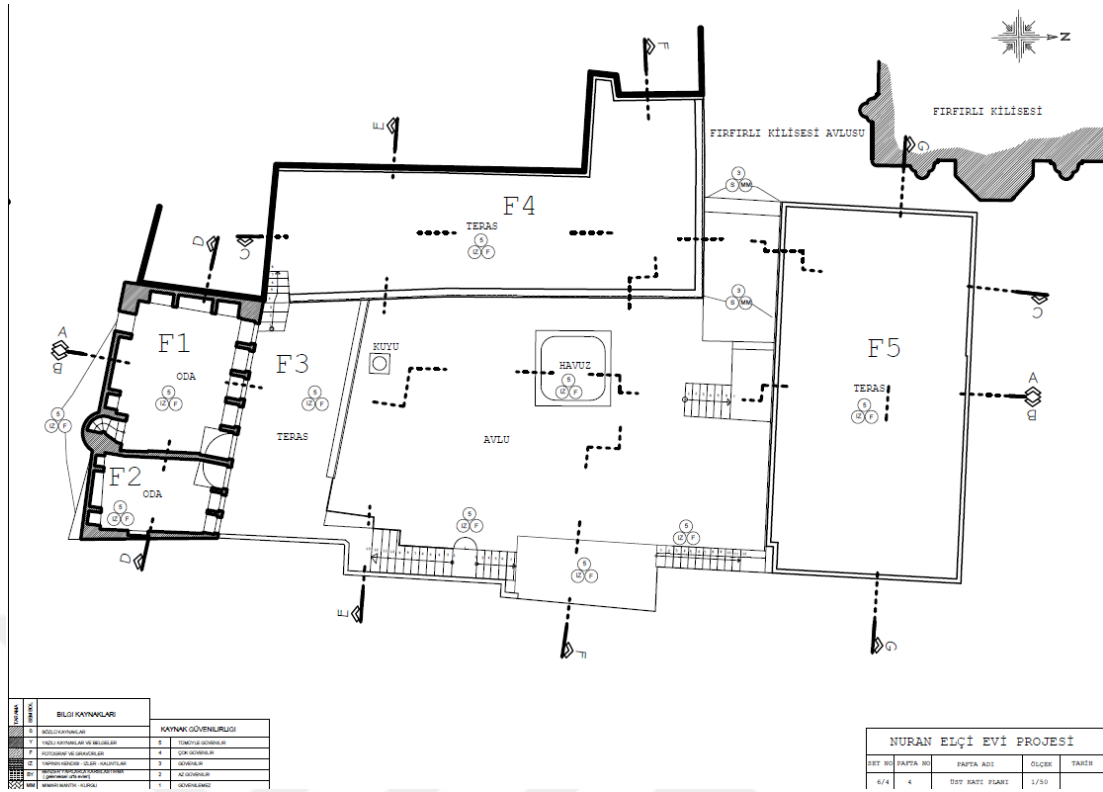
Nuran Elçi mansion restitution project first floor plan (TEMA 2008: 42)
